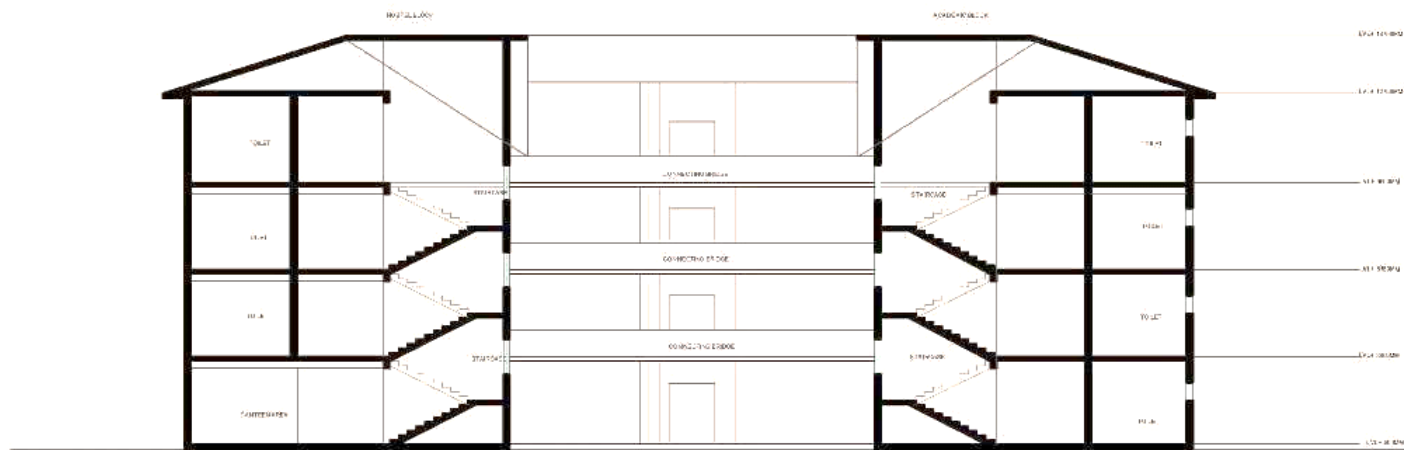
Layout Plan and Drawings of RLC Nalagarh
